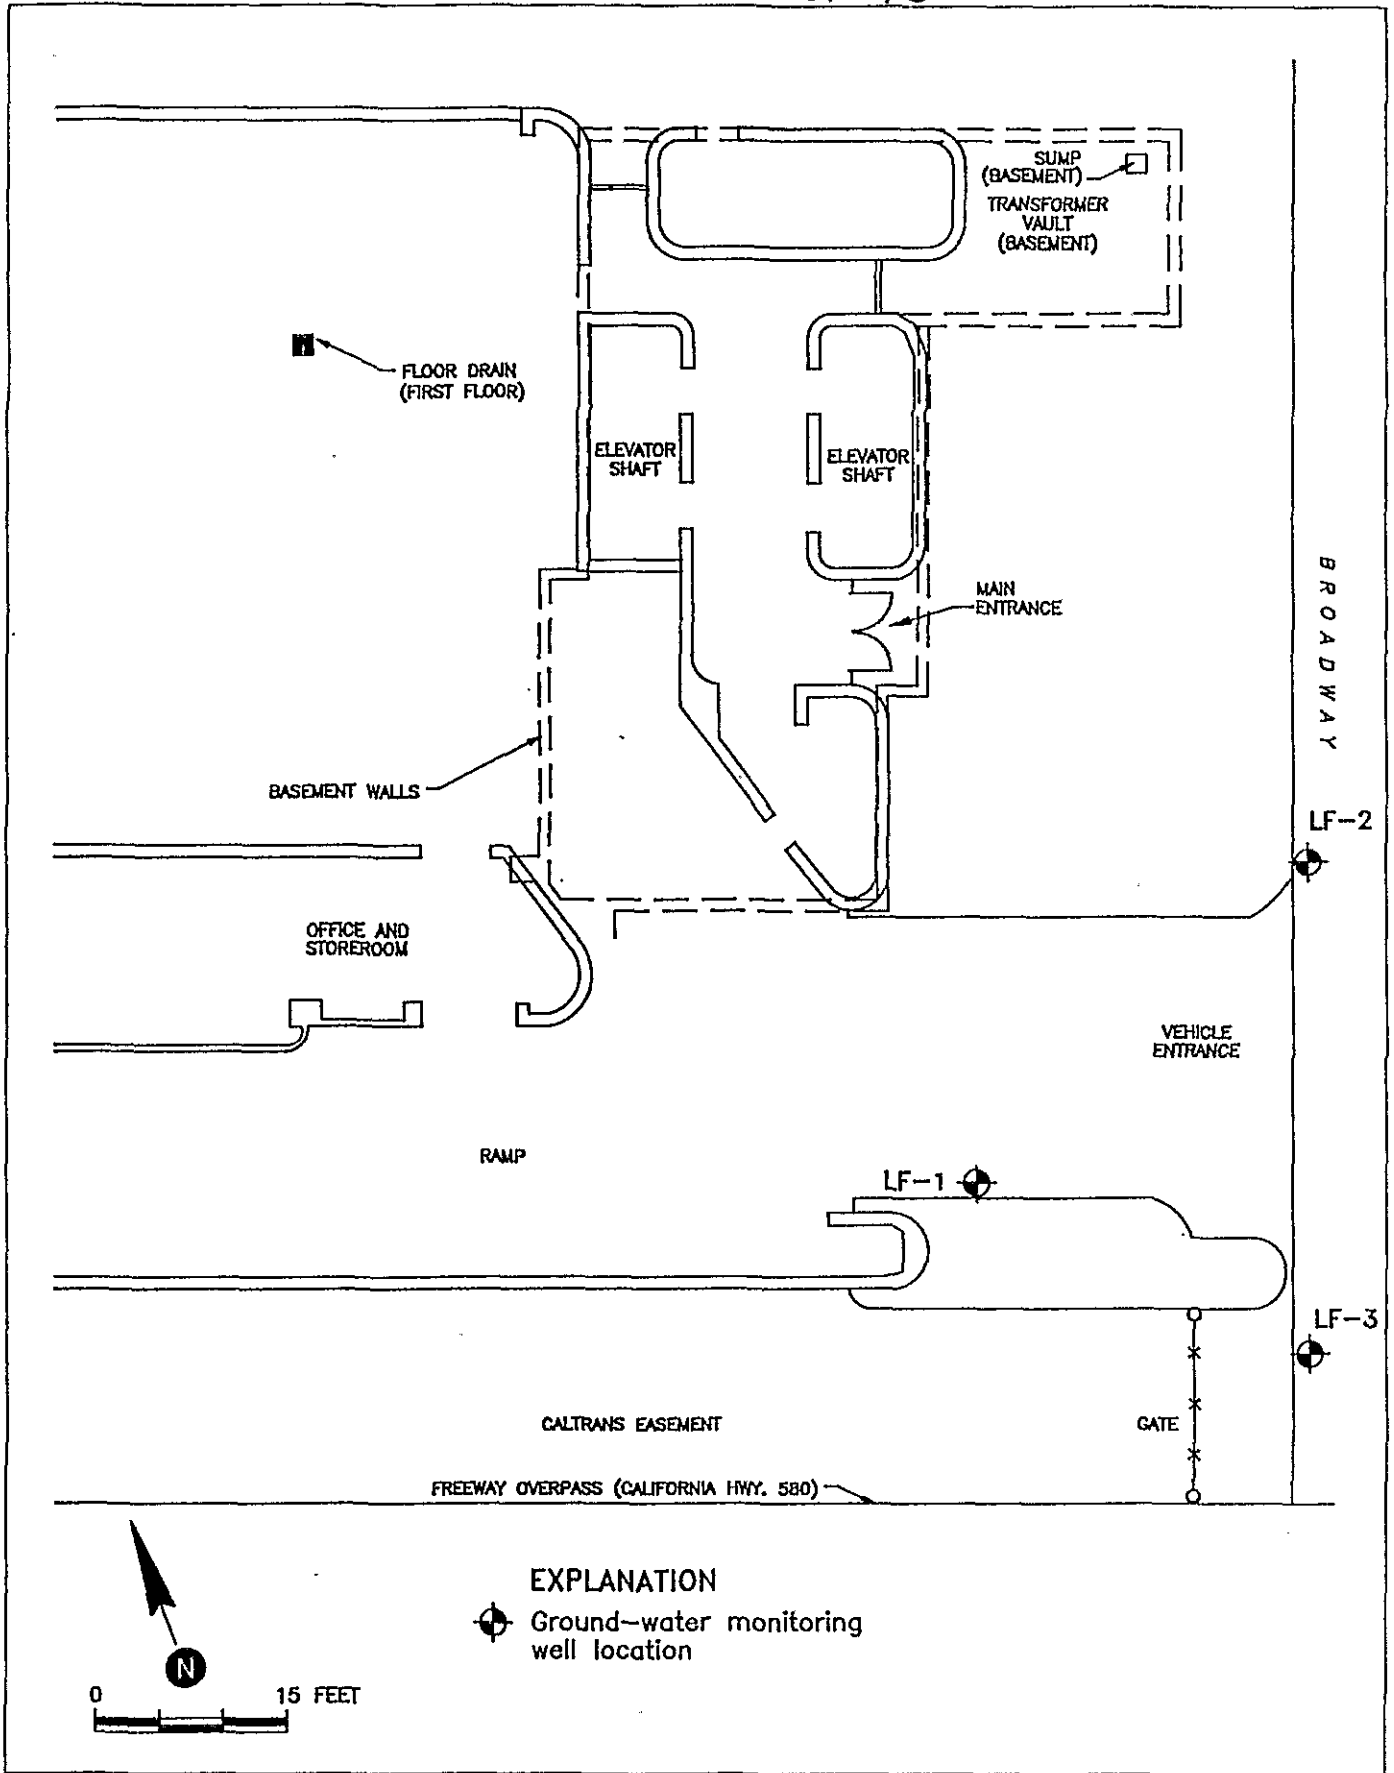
SITE PLAN AND MONITORING WELL LOCATIONS
